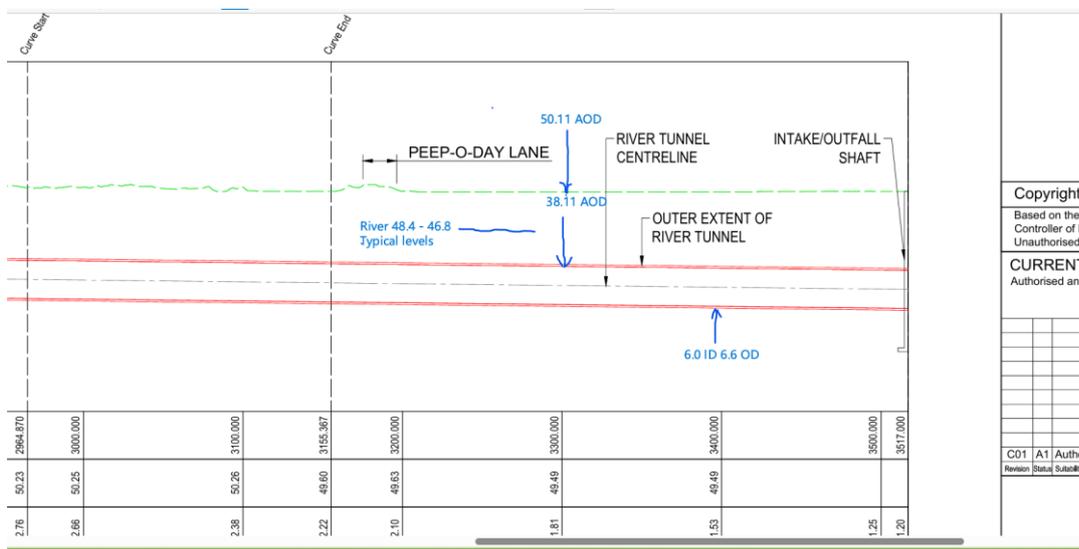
Plan and elevation of discharge tunnel at the River Thames end
